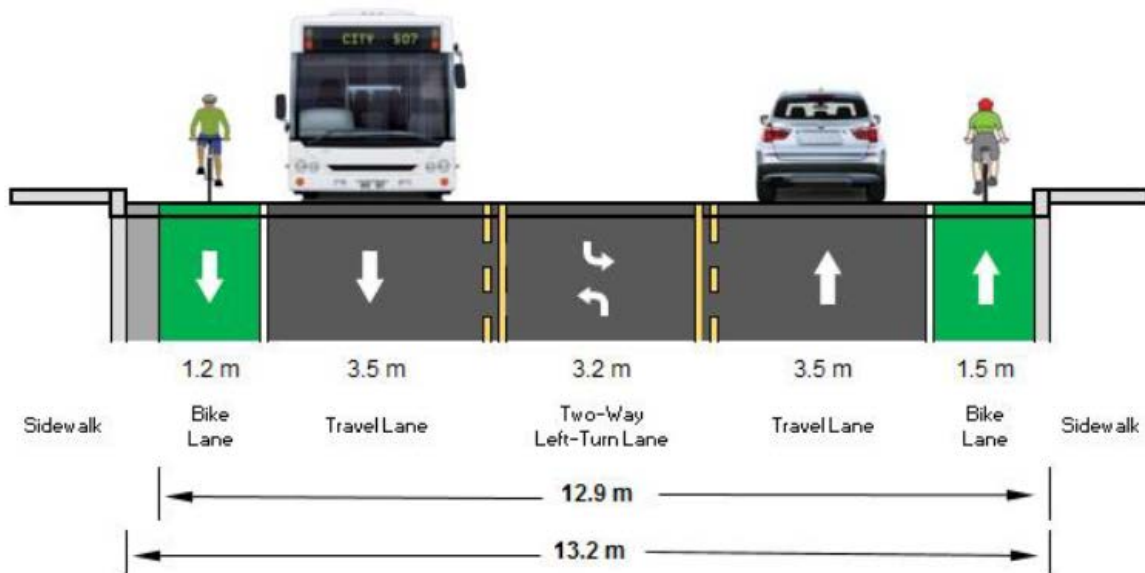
Proposed Configuration between Sackville Road and Great Northern Road
